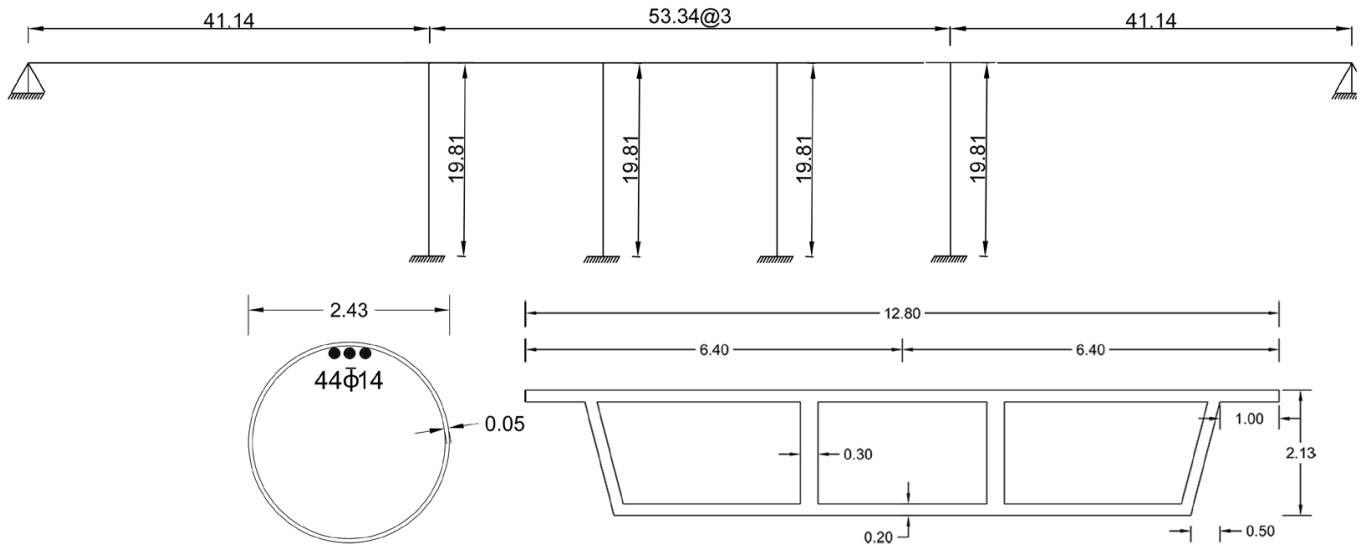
Longitudinal and cross section of the bridge deck & pier of TY0H Bridge (Dimension in meters) [13]
